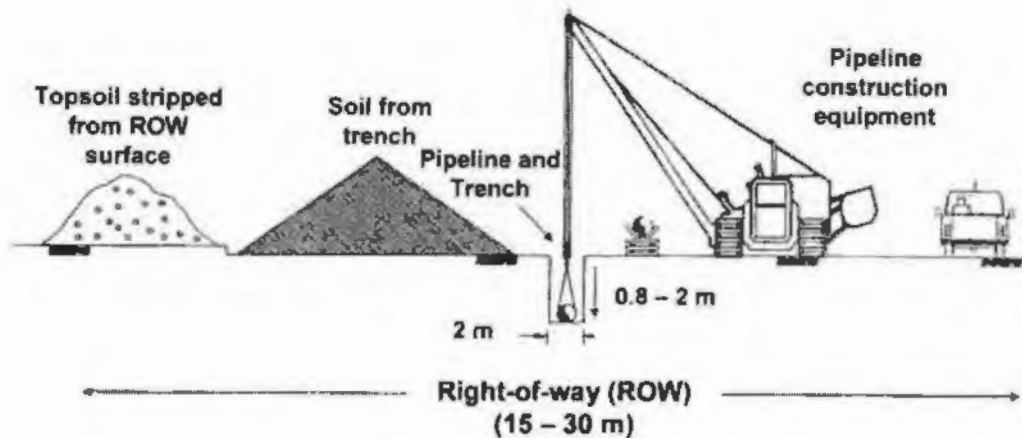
Example of pipeline construction spacing and layout of soil (Desserud *et al.* 2010).
